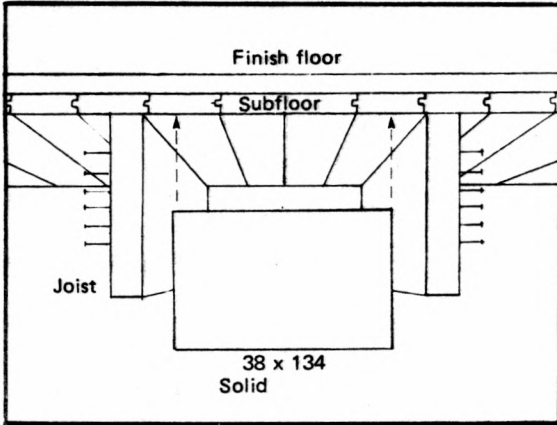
REPAIRING SQUEAKING BY INSTALLING BLOCKING BETWEEN JOIST
